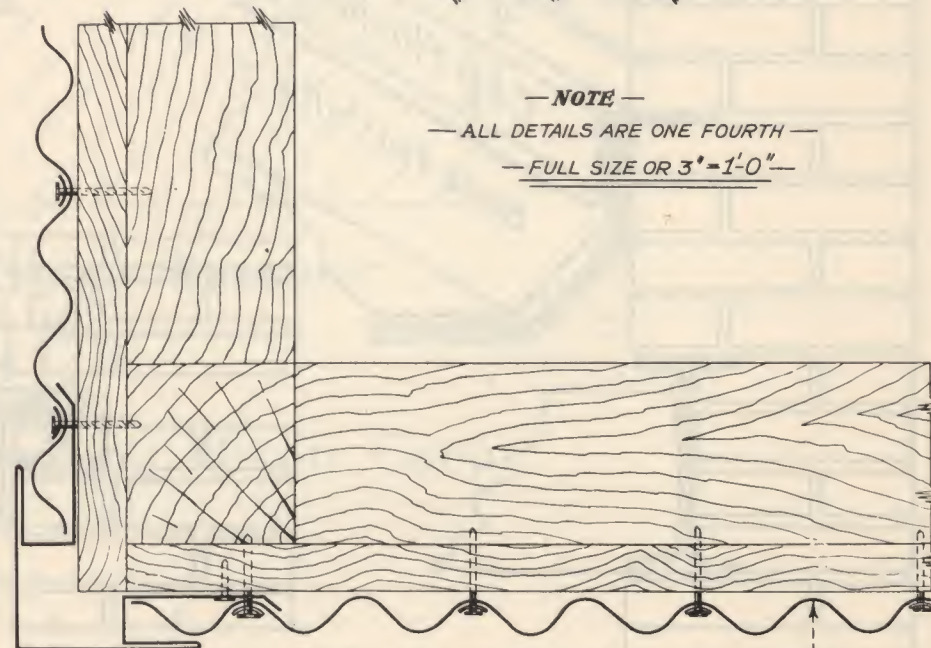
SECTION ON LINE H-H IN FIG. 2 ON DRAWING N° 1
